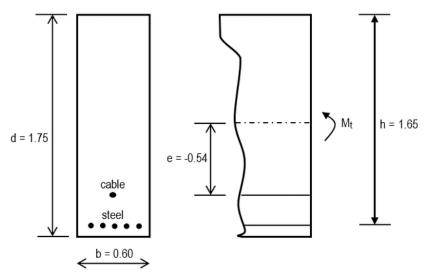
The partial stressing of prestressed concrete system (geometry unit in m) for rectangular cross section of bridge girder
